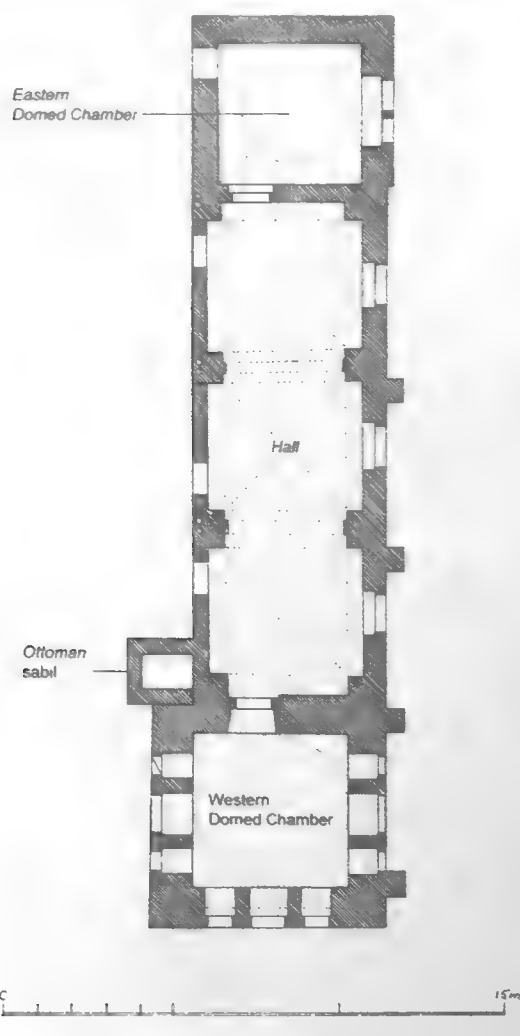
Madrasa al-Nahawiyya, sketch plan of upper floor (second phase).
